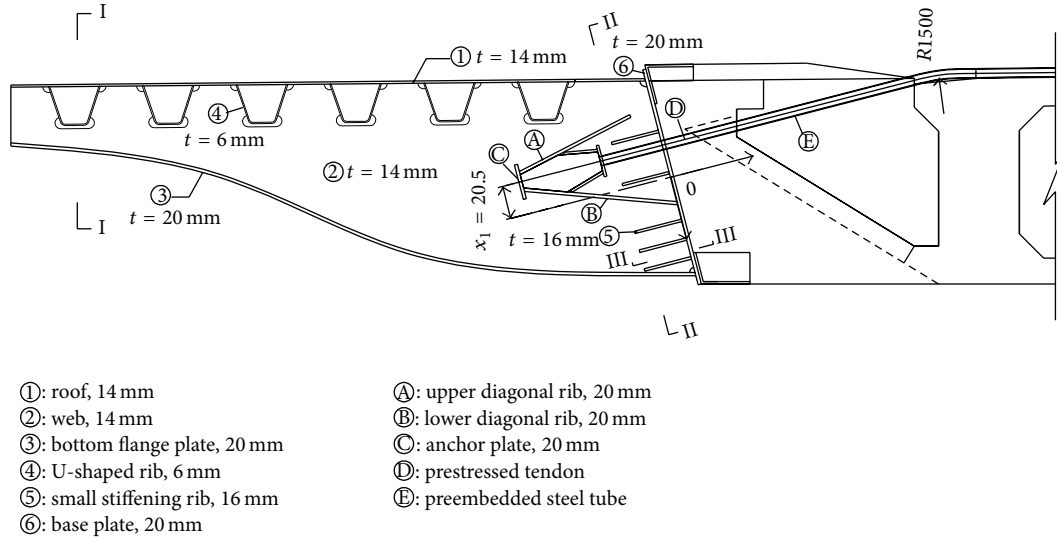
Steel cantilever elevational drawing (unit: mm).
